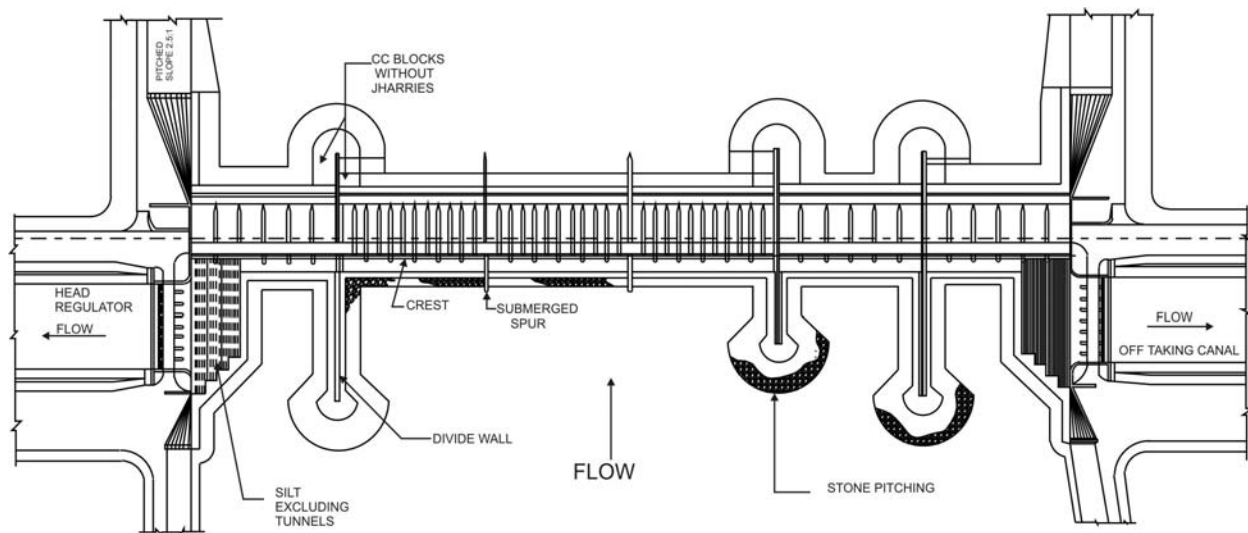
TYPICAL LAYOUT OF A BARRAGE AND ITS APPURTENANT STRUCTURES
